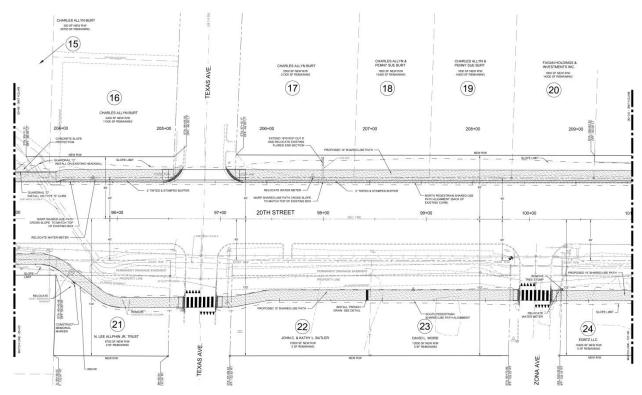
Draft Sidewalk Plans for East 20th Street, including a shared-use trail and additional space to accommodate stormwater management areas. [Source: Tri-State Engineering.]
